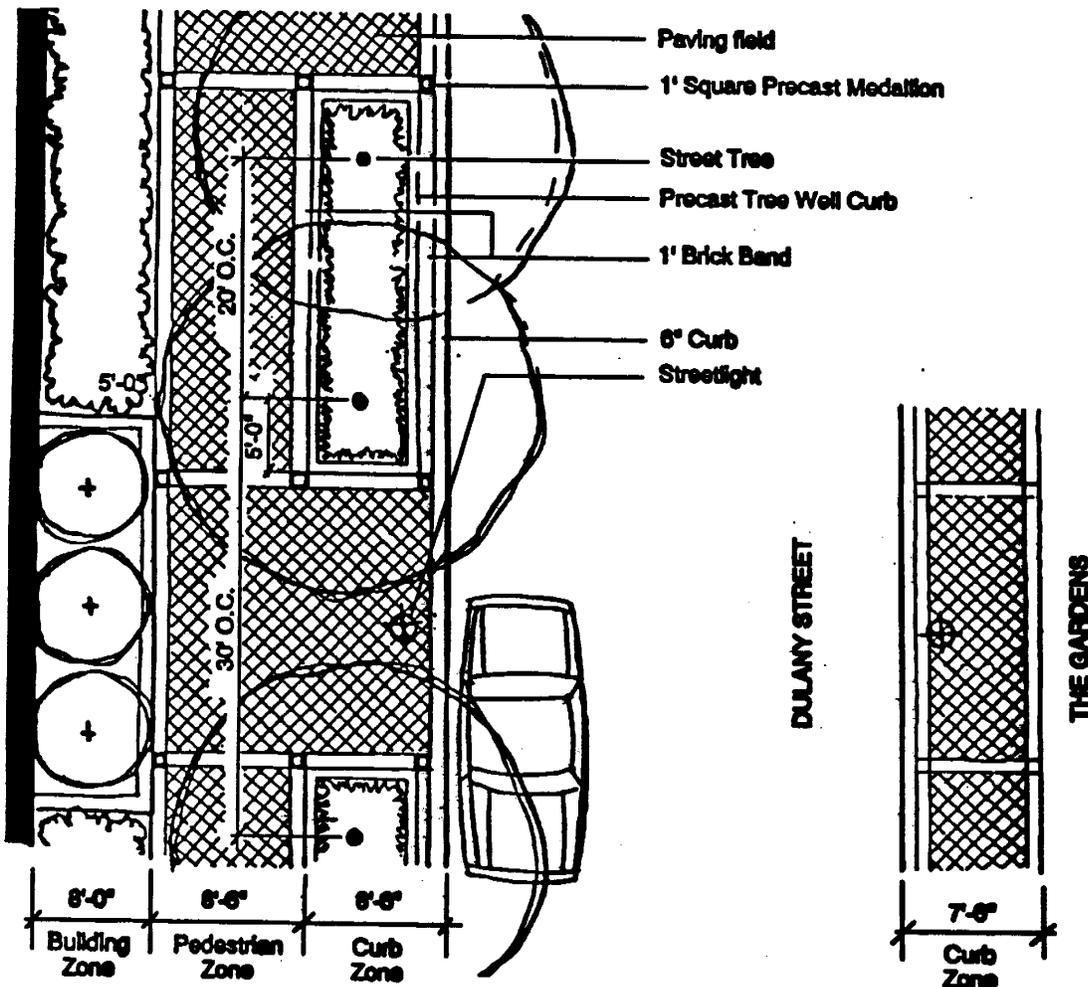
Dulany Precinct - Gardens Typical Streetscape
